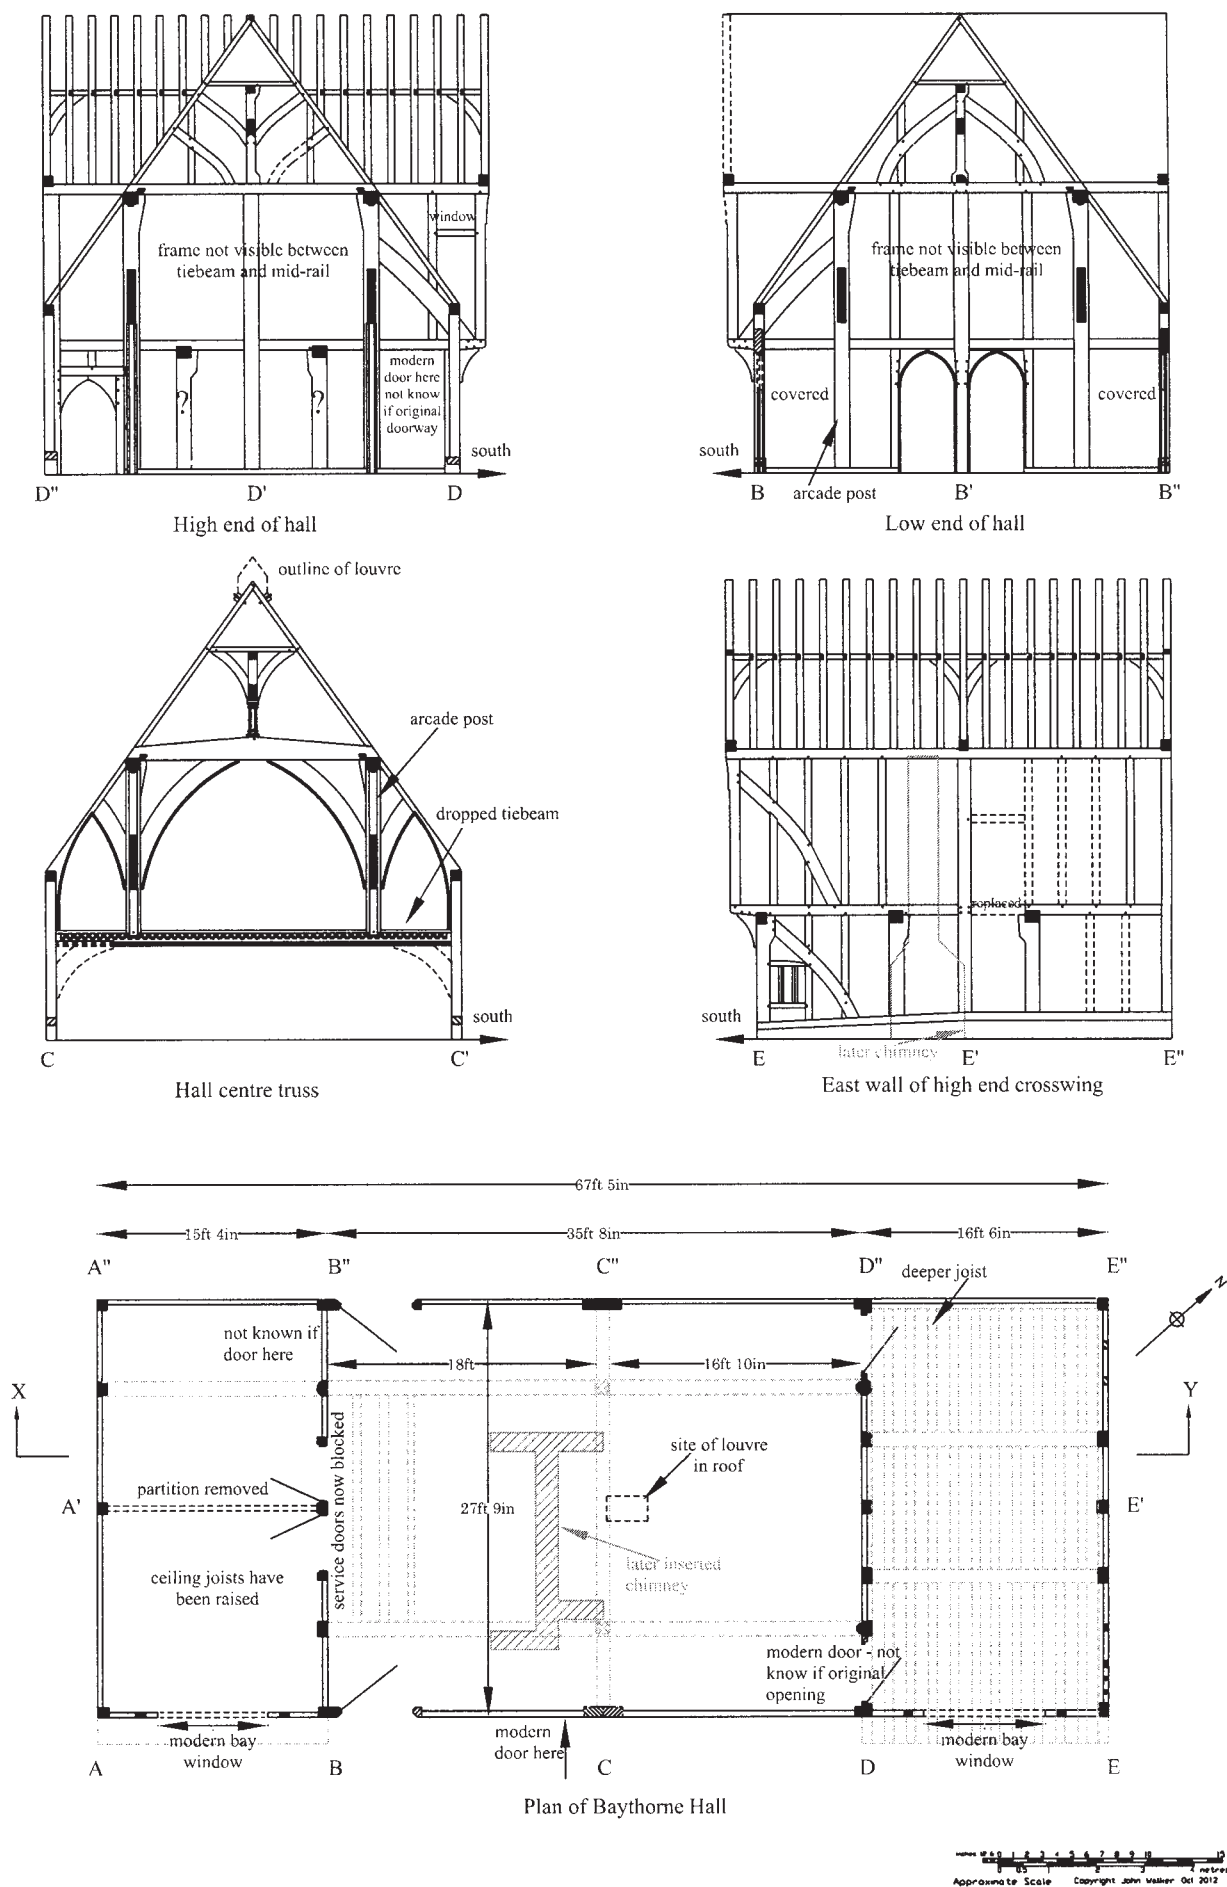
Baythorne Hall, ground plan and transverse sections
